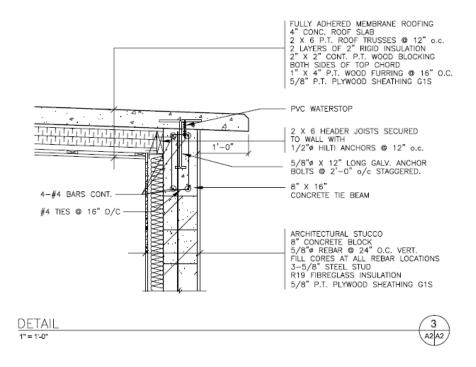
TYPICAL EQUIPMENT BUILDING STRUCTURAL DESIGN - KEY STRUCTURAL DESIGN AREAS HIGHLIGHTED
